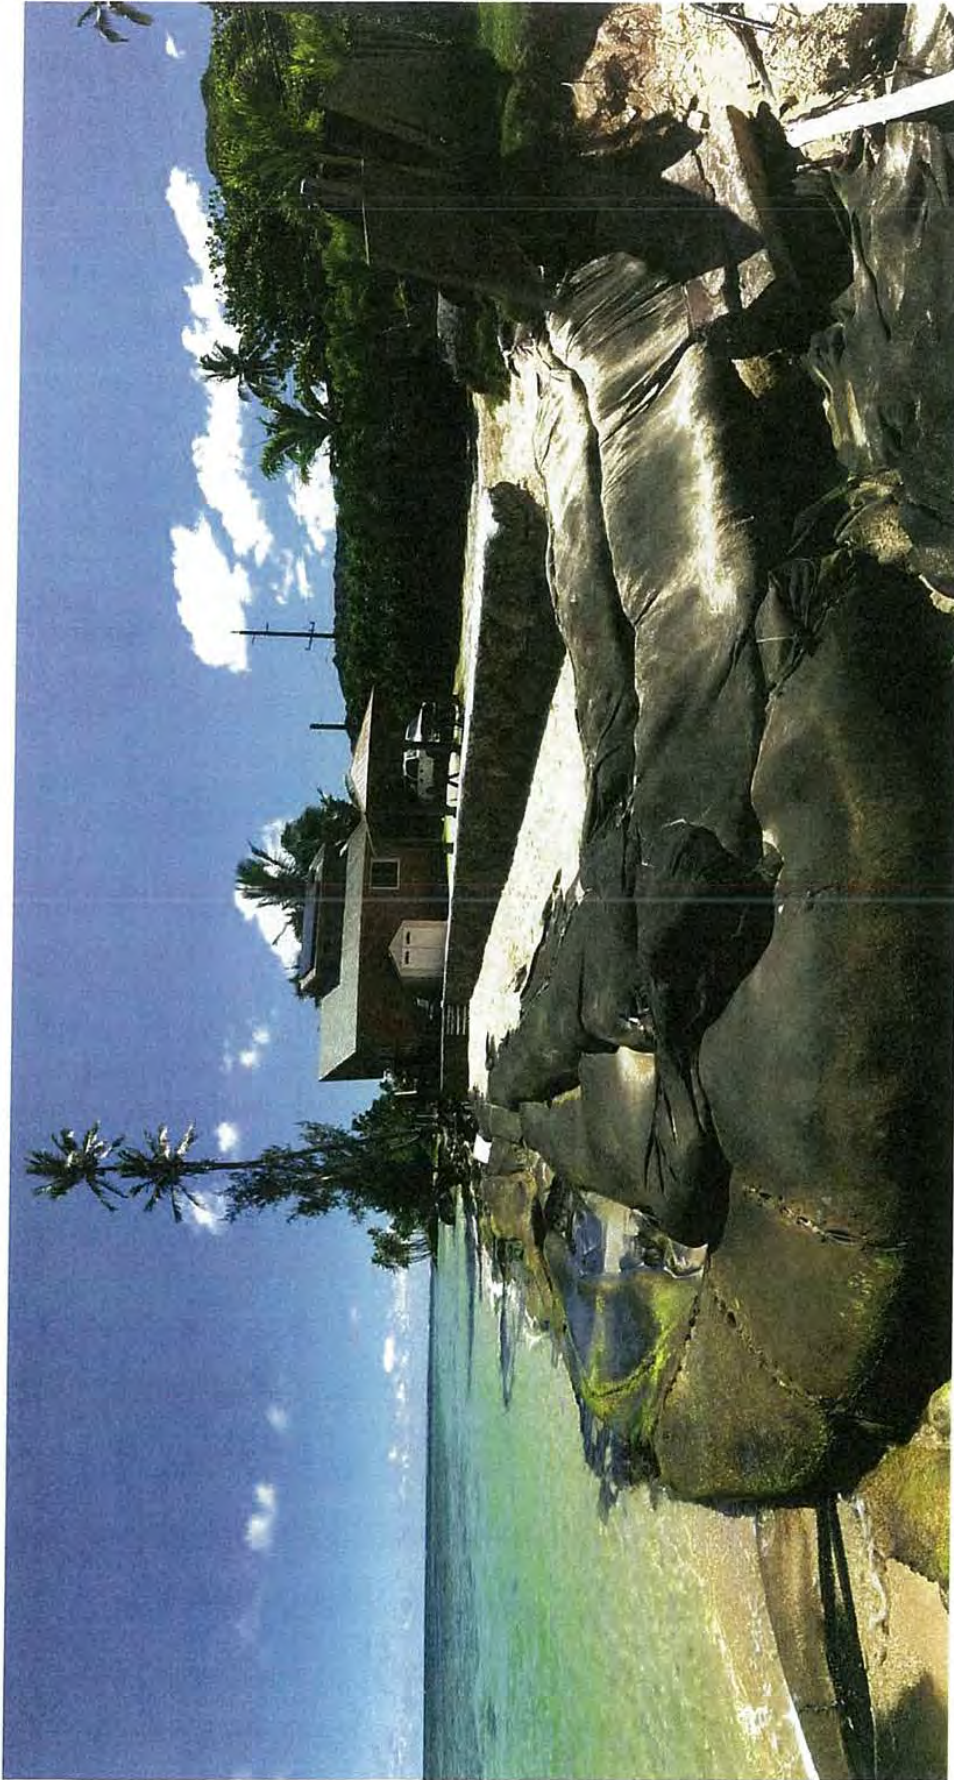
OCCL Staff Photo Taken 9/28/2022
